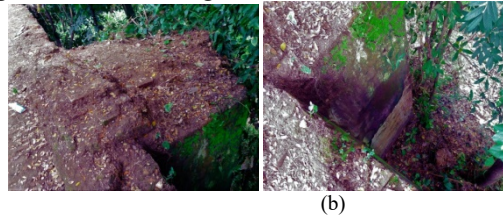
(a) Damages of Chapatali Brick Bridge, (b) Pillar of Chapatali Bridge
